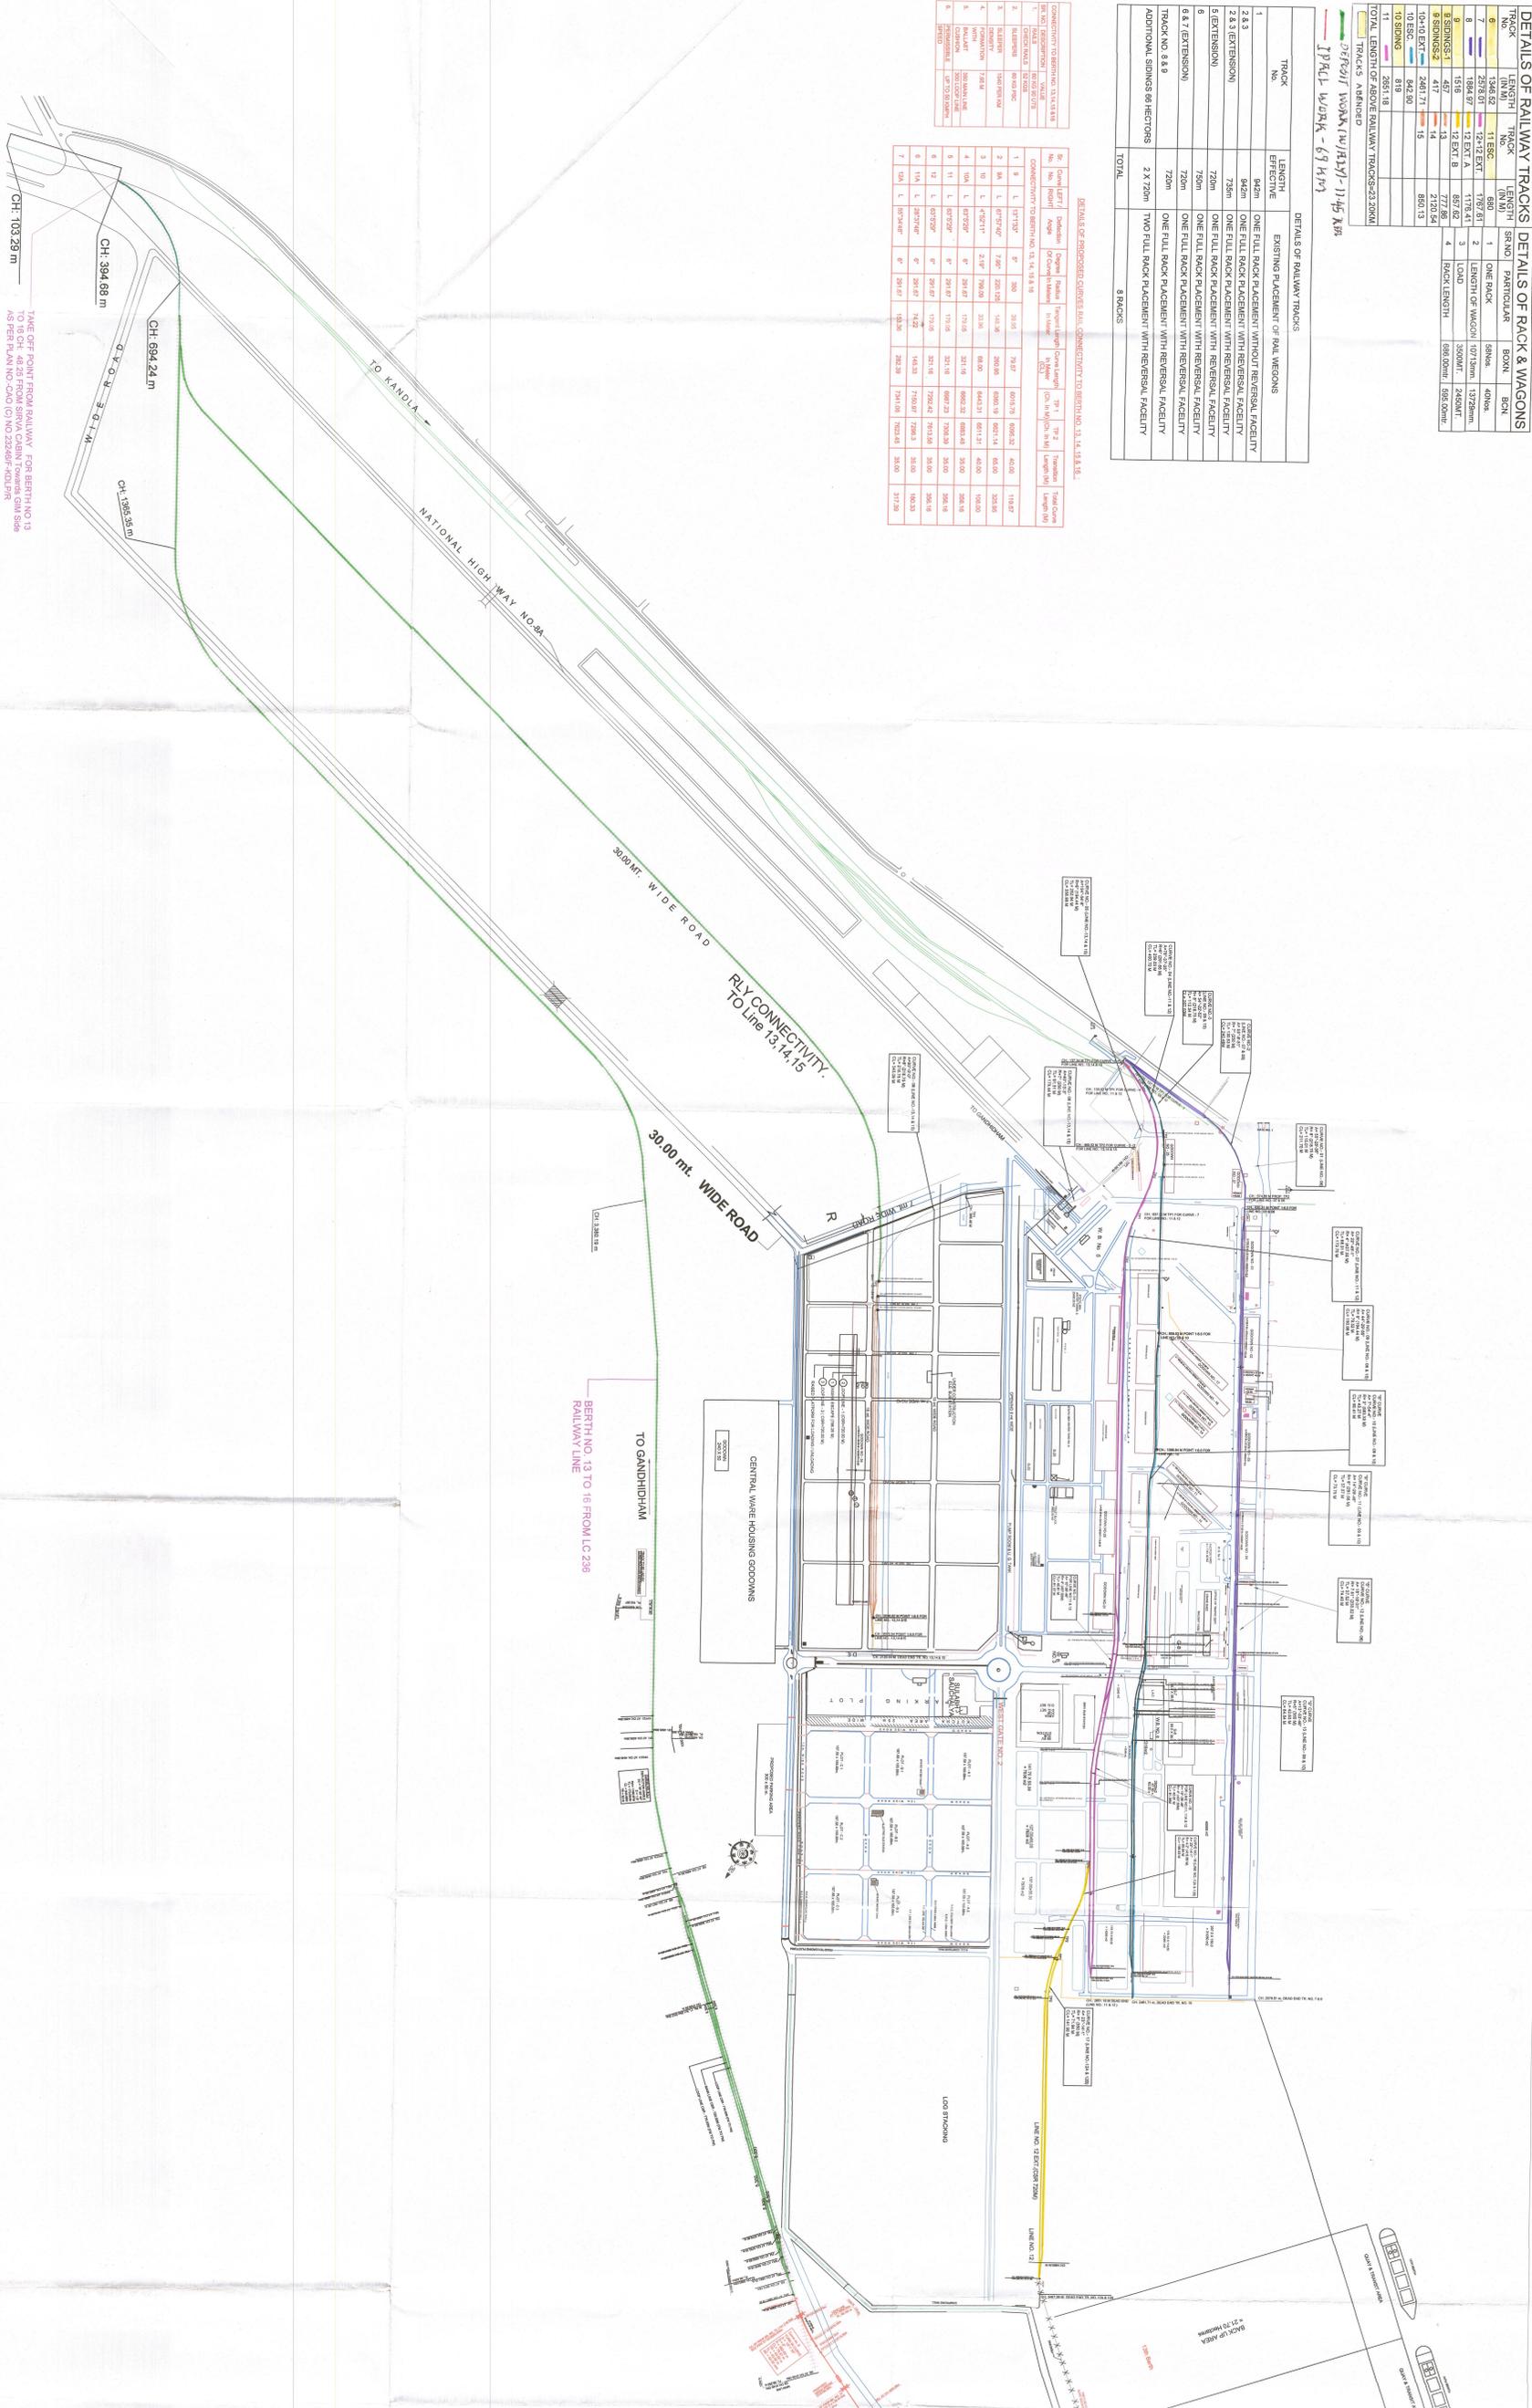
DETAILS OF RAILWAY TRACKS		DETAILS OF RACK & WAGONS
